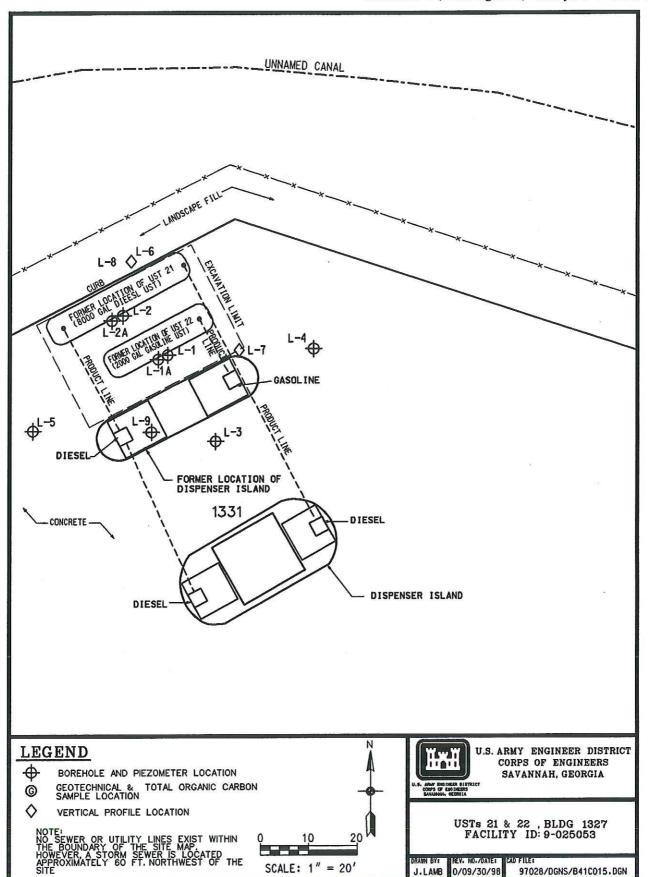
Site Plan for the USTs 21 & 22, Building 1327 Site
